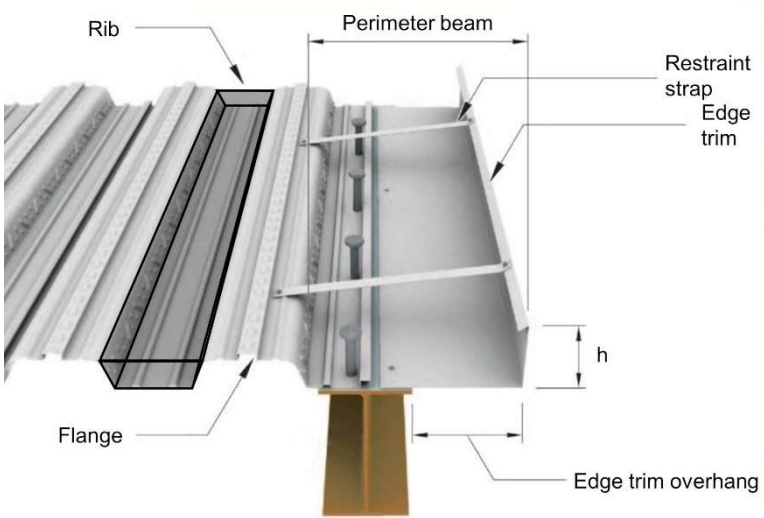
Typical edge configurations with wide perimeter beam - parallel orientation of the steel decking [63]
